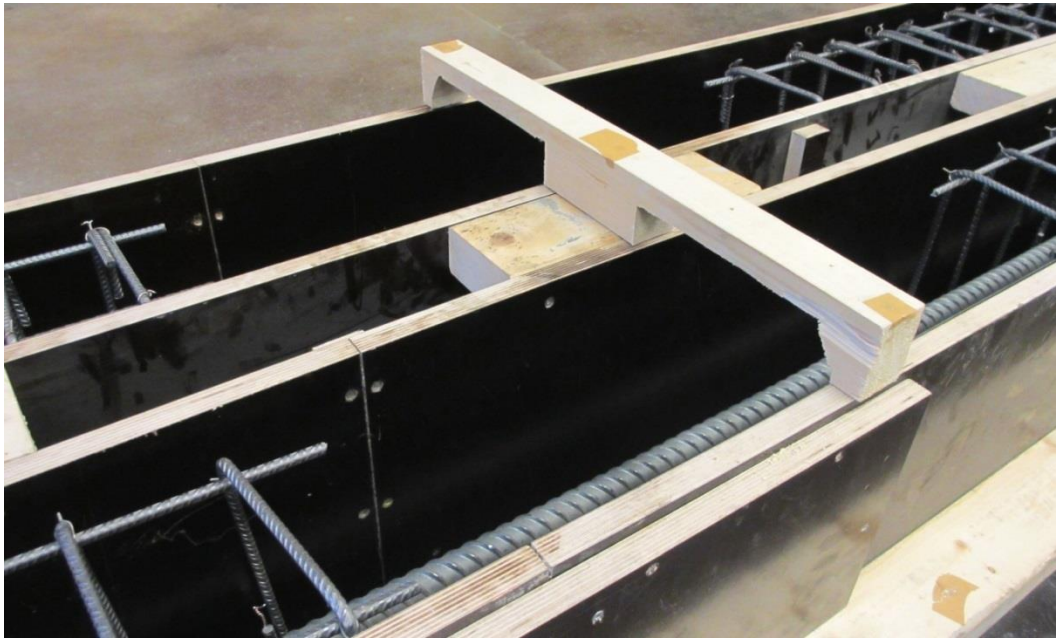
Side view of the reinforcement in the formwork with longitudinal top bars removed at mid-span.
